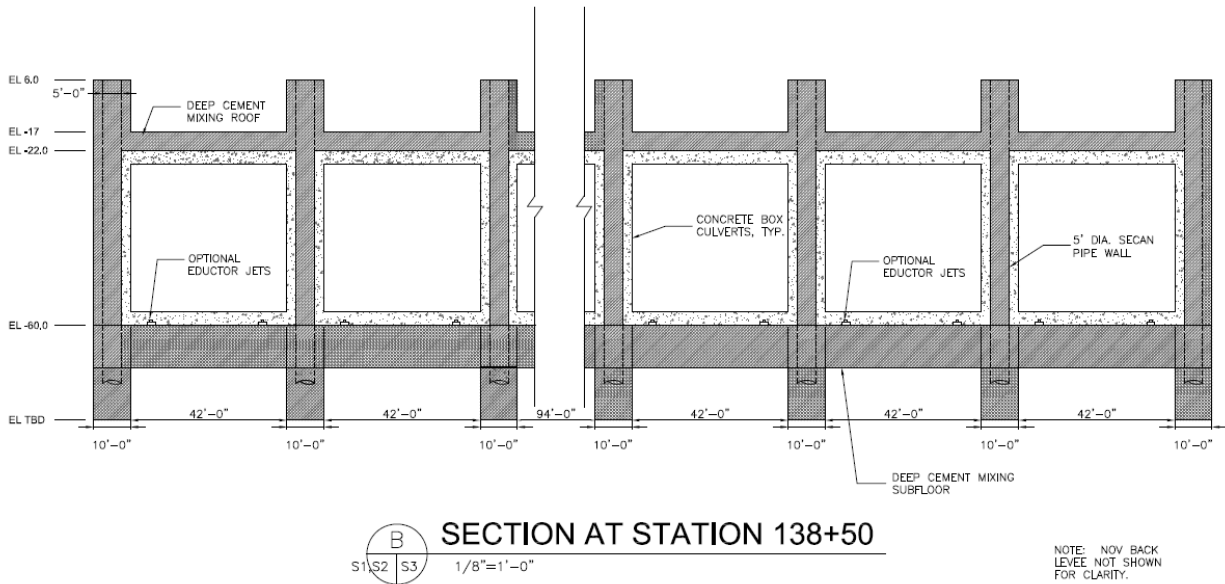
Alt. C – Cross-Sectional View of the Outlet Submerged Box Culverts, with a Cast-In-Place Concrete Liner (This Image Shows How Educator Jets (which could be either embedded in, or on top of, the floor slab) Can Prevent the Submerged Box Culverts from Plugging with Sediment)
